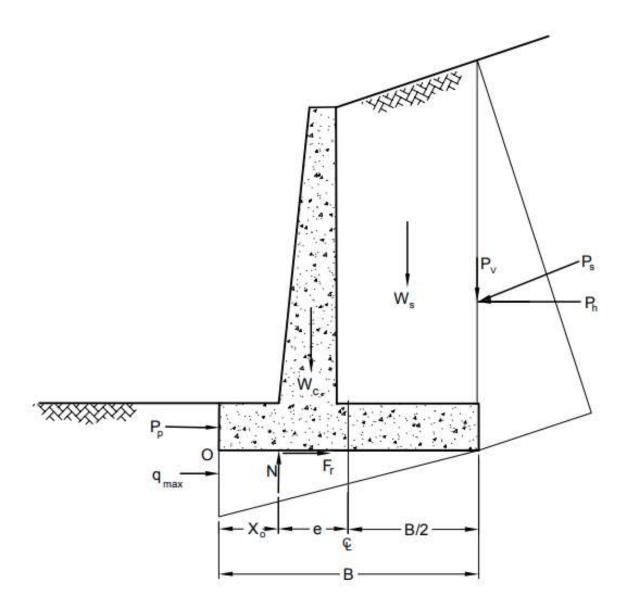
FORCES ON CANTILEVER RETAINING WALL
